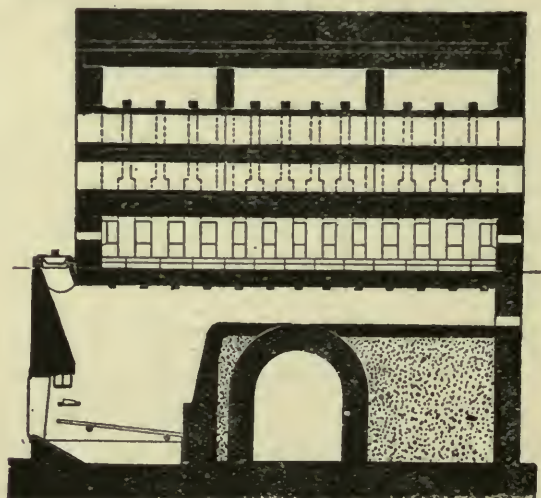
Horizontal Gas Retort Settings (Longitudinal Section).
